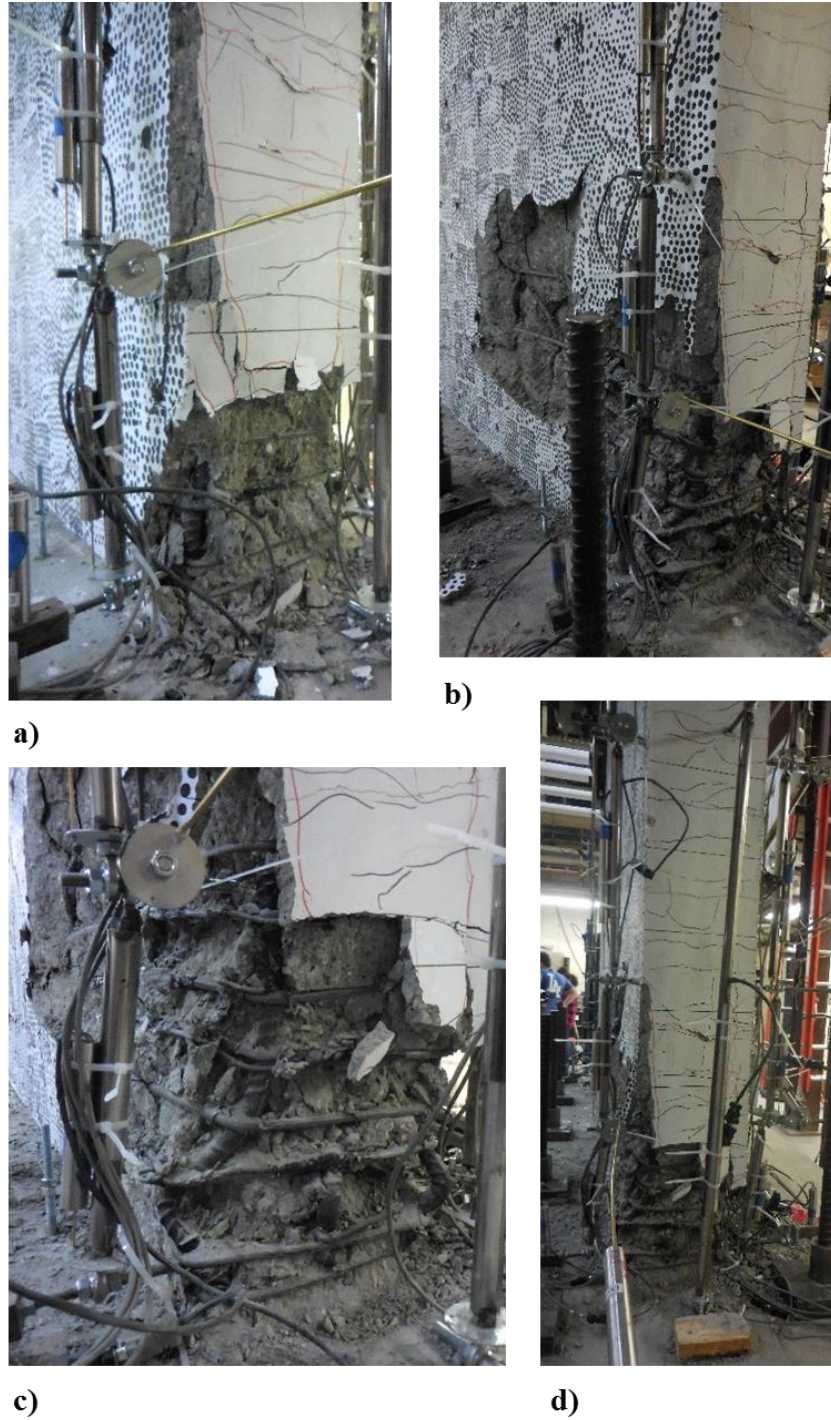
Specimen WP7 east boundary damage progression – a) Crushing of concrete and buckling of longitudinal reinforcement (-2% rotation, cycle 2); b) Boundary and web crushing damage (-3% rotation); c) Close up of damaged compression zone; and d) Out-of-plane movement
